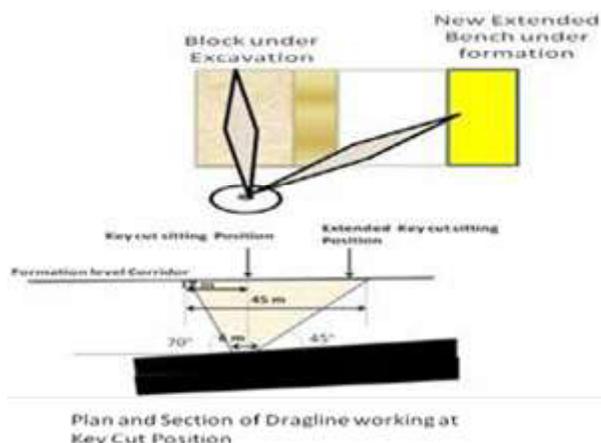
Plan and section showing Dragline Working at Key Cut Position
